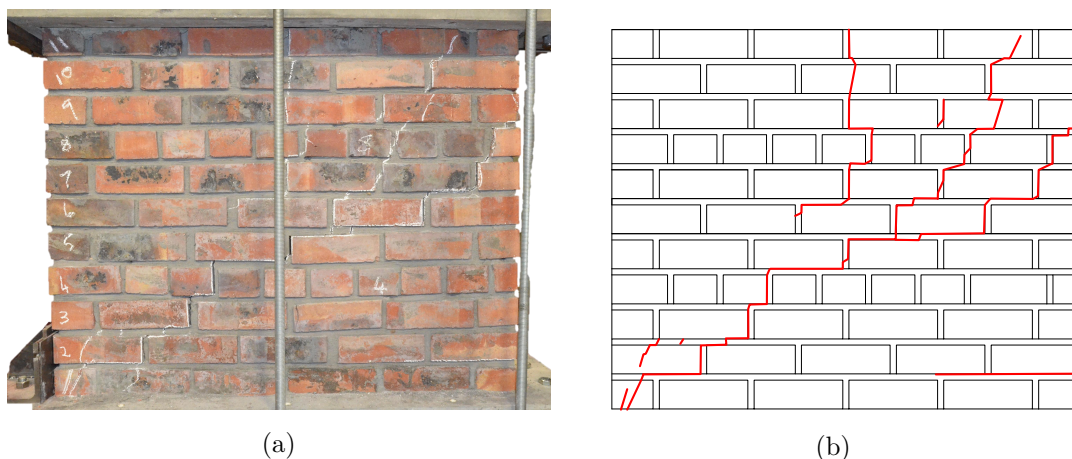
SW-220-0-2 (a) Cracked specimen; (b) Crack pattern documented
